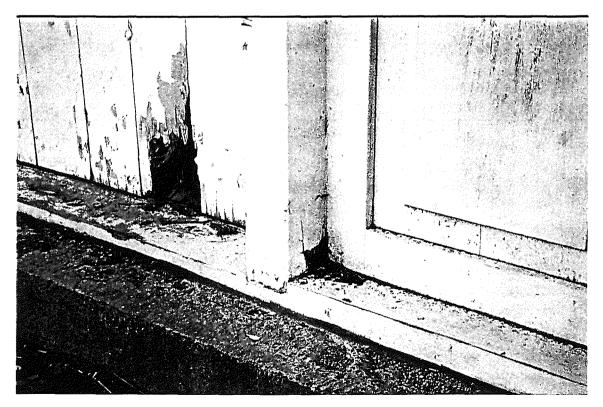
John Brown's Fort , detail at bottom of door and sidelight showing rot.
